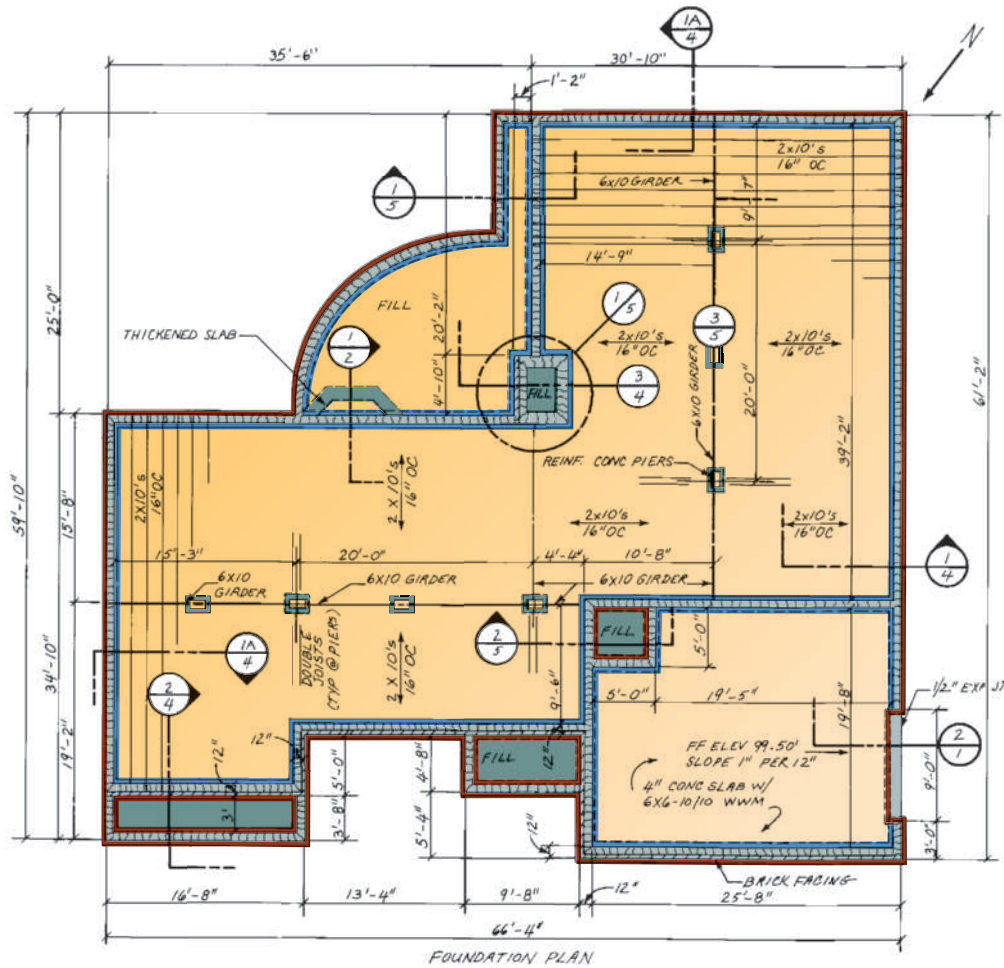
A floor plan provides dimensions to critical construction areas and illustrates major components of a design.
